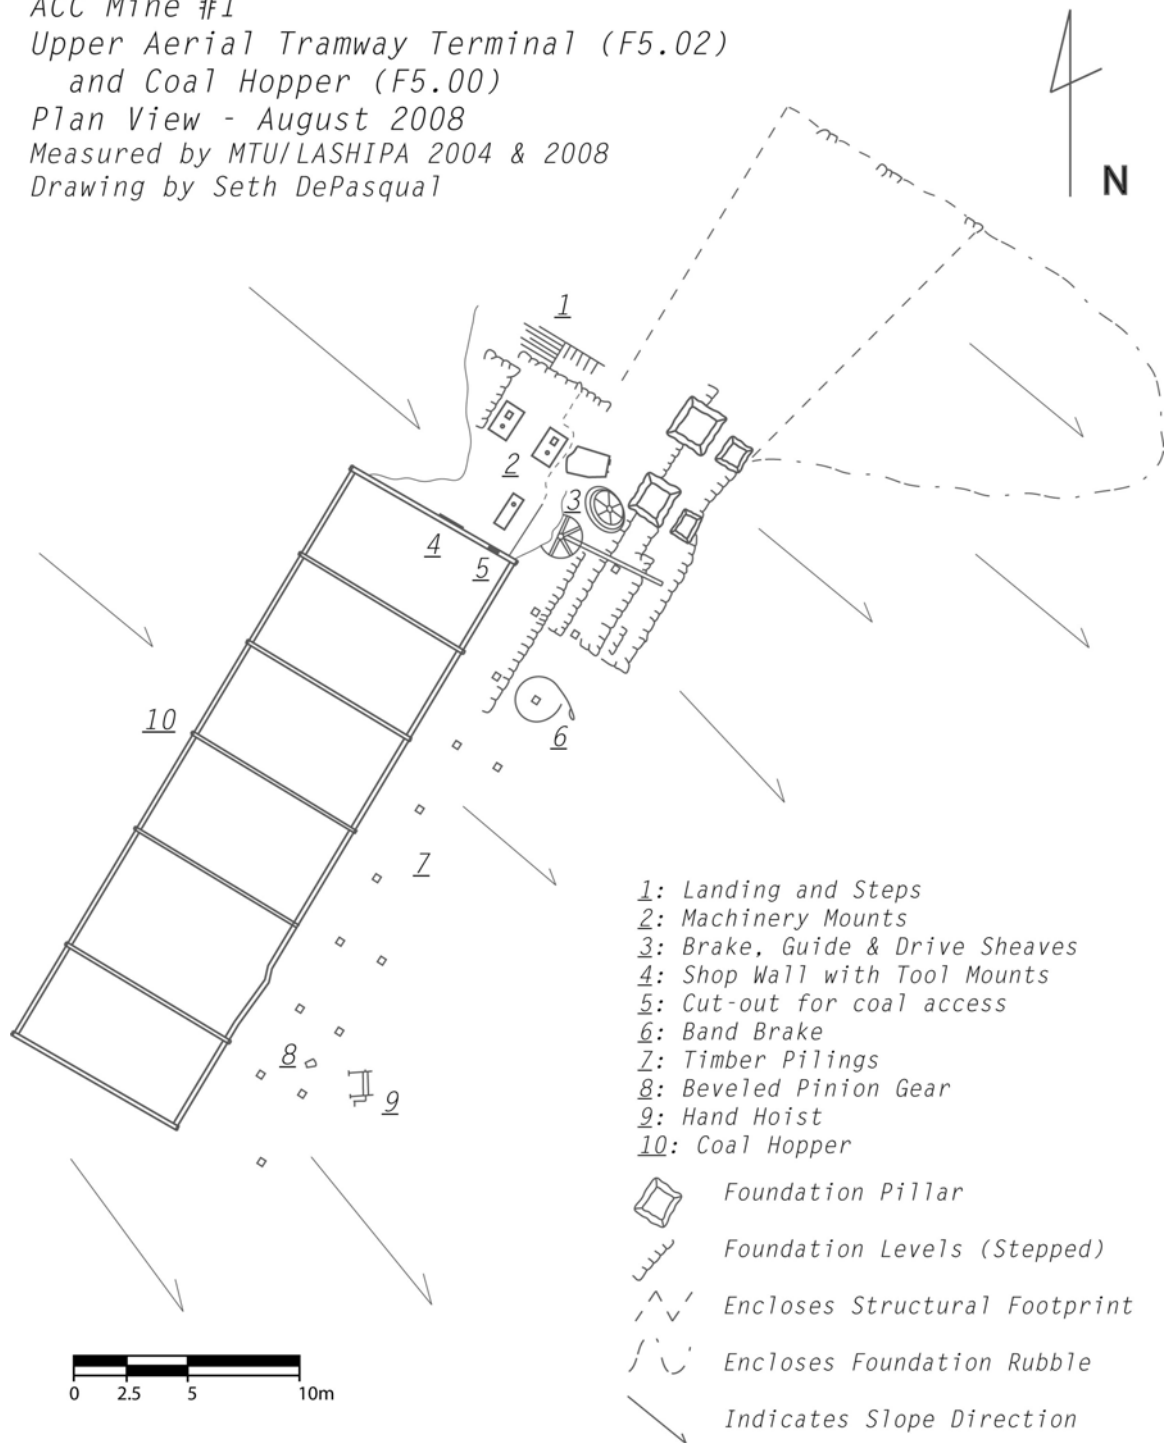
Plan View of Coal Hopper and Tramway Terminal.
